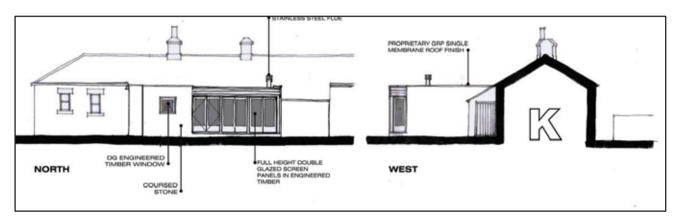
Proposed Elevation (not to scale, from Architect's Plans)
